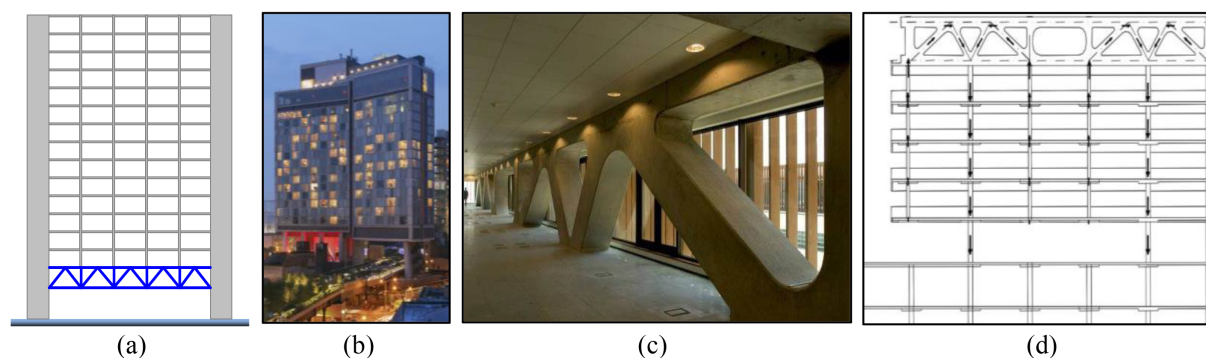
(a) Transfer truss scheme; (b) The Standard Hotel, New York, USA; (c) Art's Business & Hotel Centre, Lisbon, Portugal; (d) gravity loads path through the transfer truss in the Art's Business & Hotel Centre (Source: <sup>2</sup>, Google)
